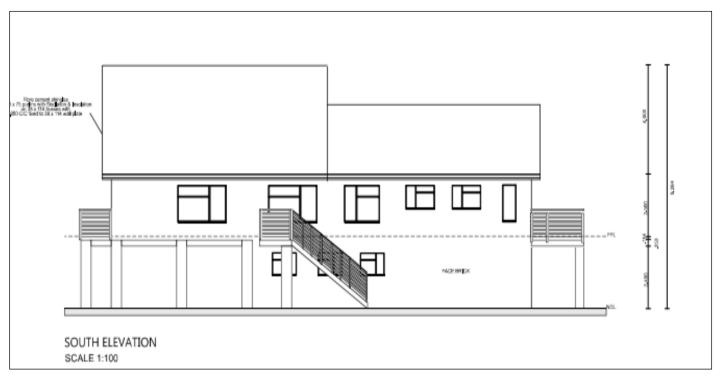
South Elevation of Proposed Managers Cottages (Louw Designs, 2023)
